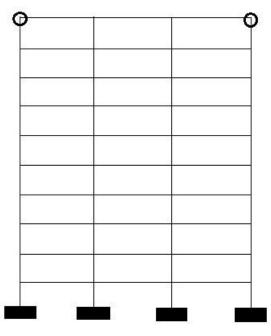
10-storey framed structure with 2 TMDs used for study
